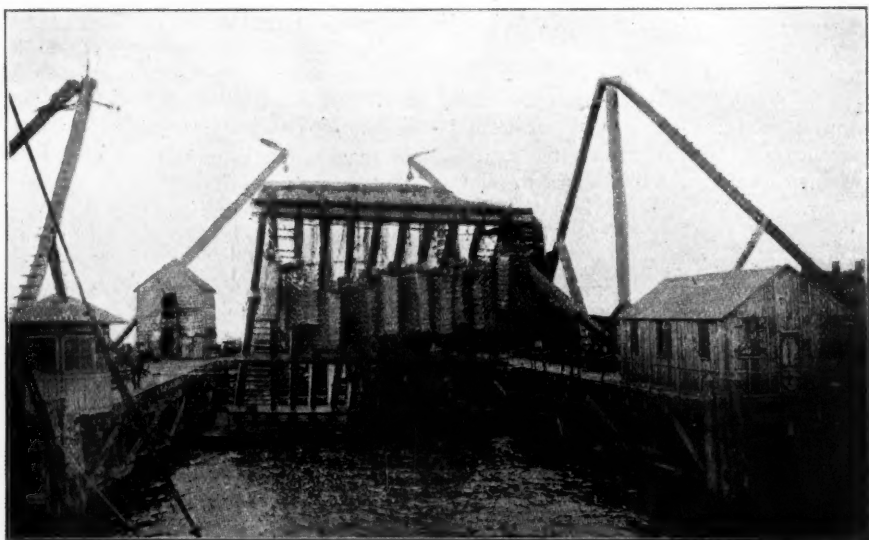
FIG. V.—LEAD WEIGHTS HUNG ON TOWER OR DERRICK OF CAISSON.
